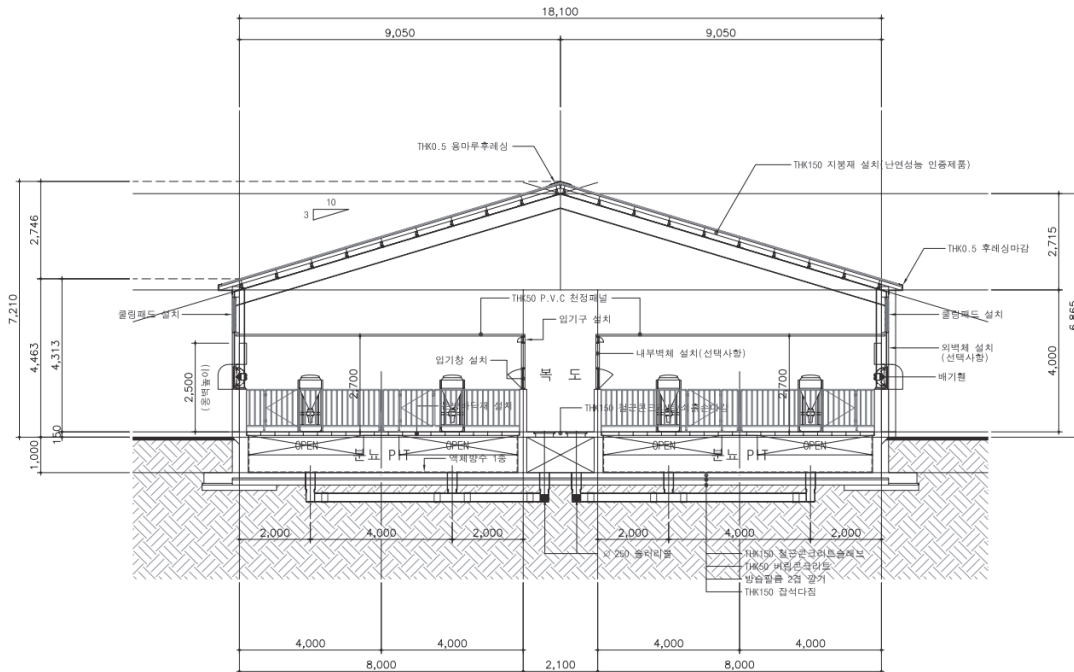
Example drawing of 3<sup>rd</sup> generation design standard with livestock house (MAFRA · NH, 2021, Longitudinal section of fattening pig house)
